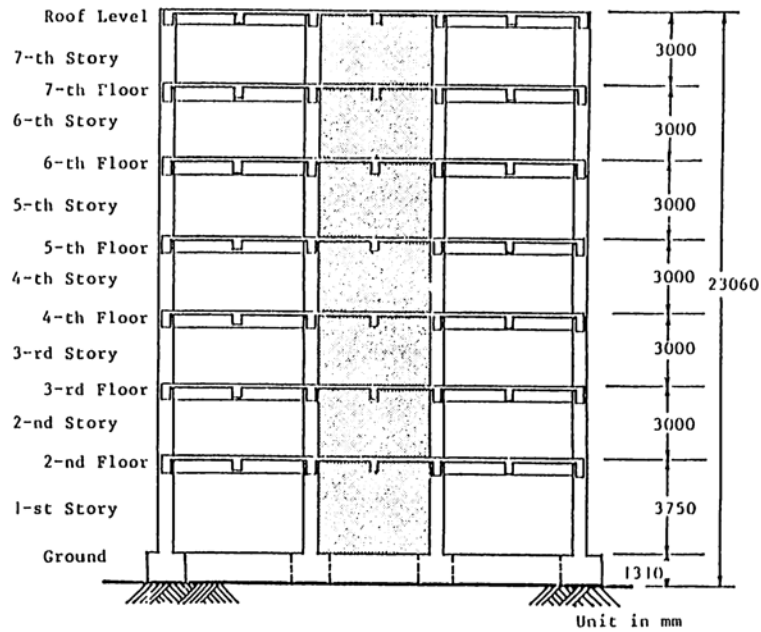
Side View of the Seven-Story Full-Scale Building [12]
